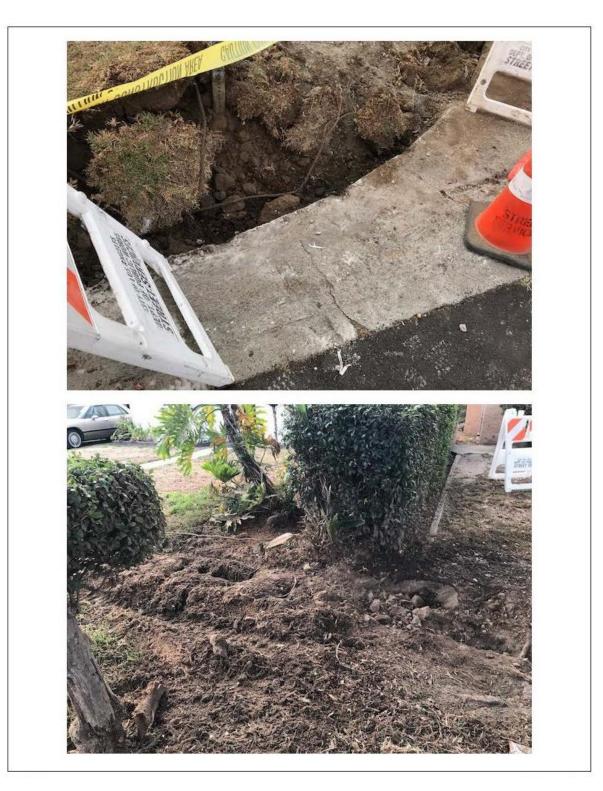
Photos of Existing Curb and Sidewalk Removed (above) Photo of Construction – Root Pruning – Existing Sidewalk Removed (below)
